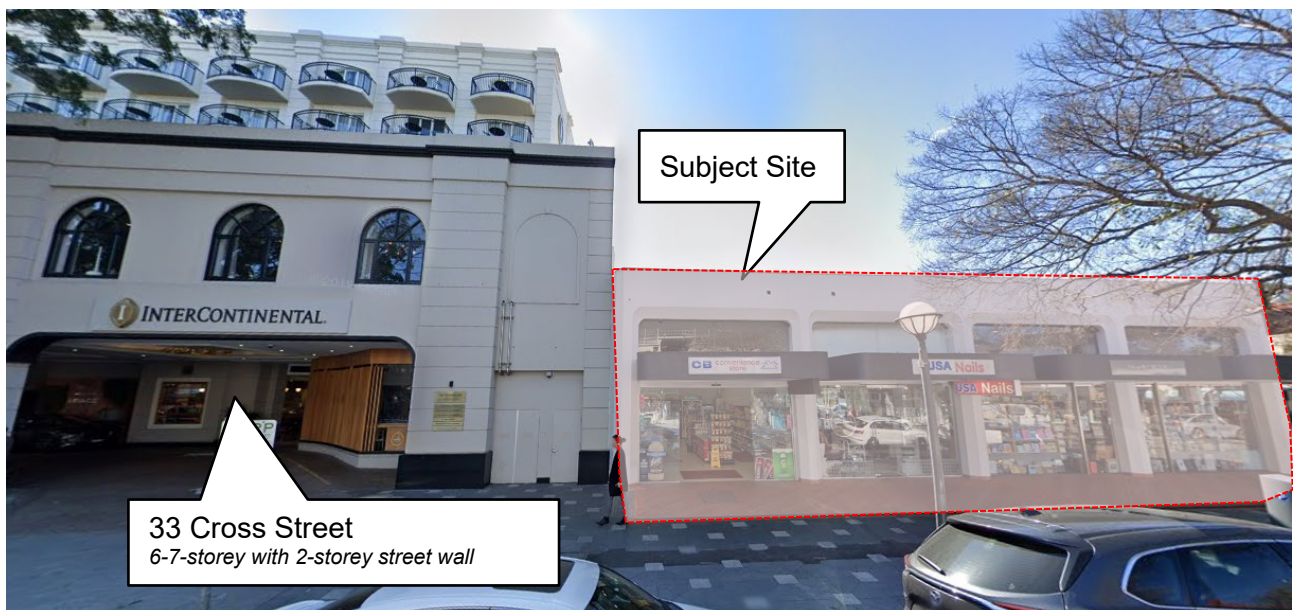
Existing Site, as viewed from Cross Street (Source: wmcgislive mapping)
